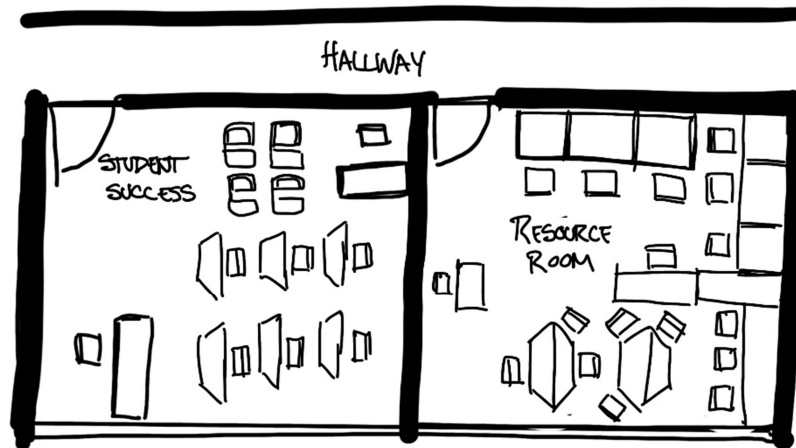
SCHOOL B PROJECT SPACE FLOOR PLAN
